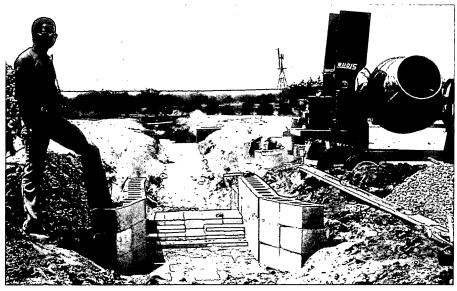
Upstream view of a flume being constructed from concrete block. The sill and the bulk of the ramp are constructed from block, and the ramp surface is finished with hand-troweled concrete. Mortaring the entire inside surface is recommended.
